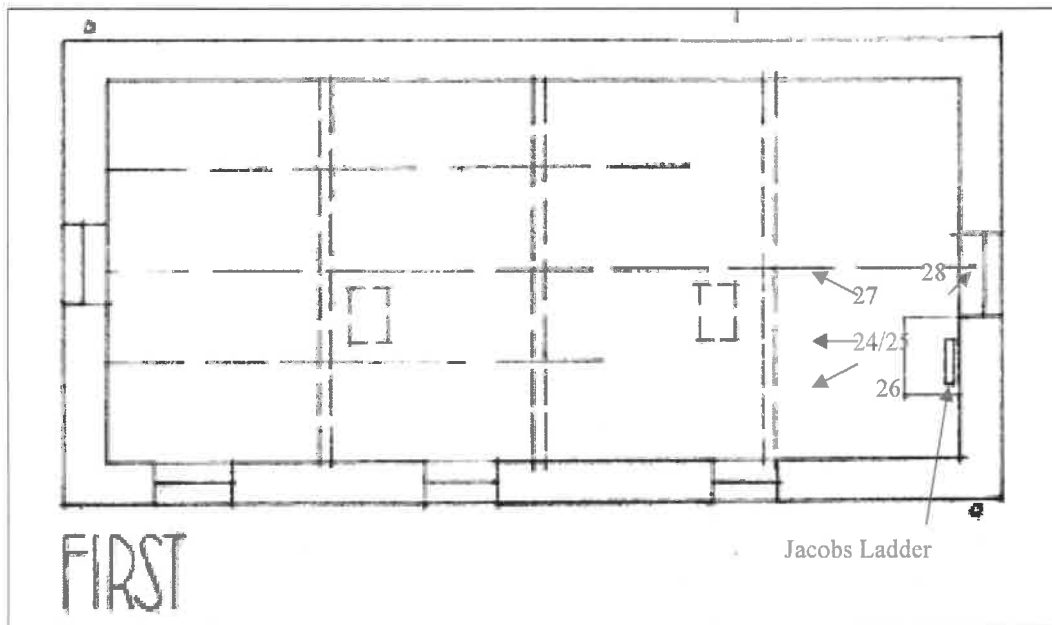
Location & direction of Barn A first floor photographs (Drawing J Wharton)
